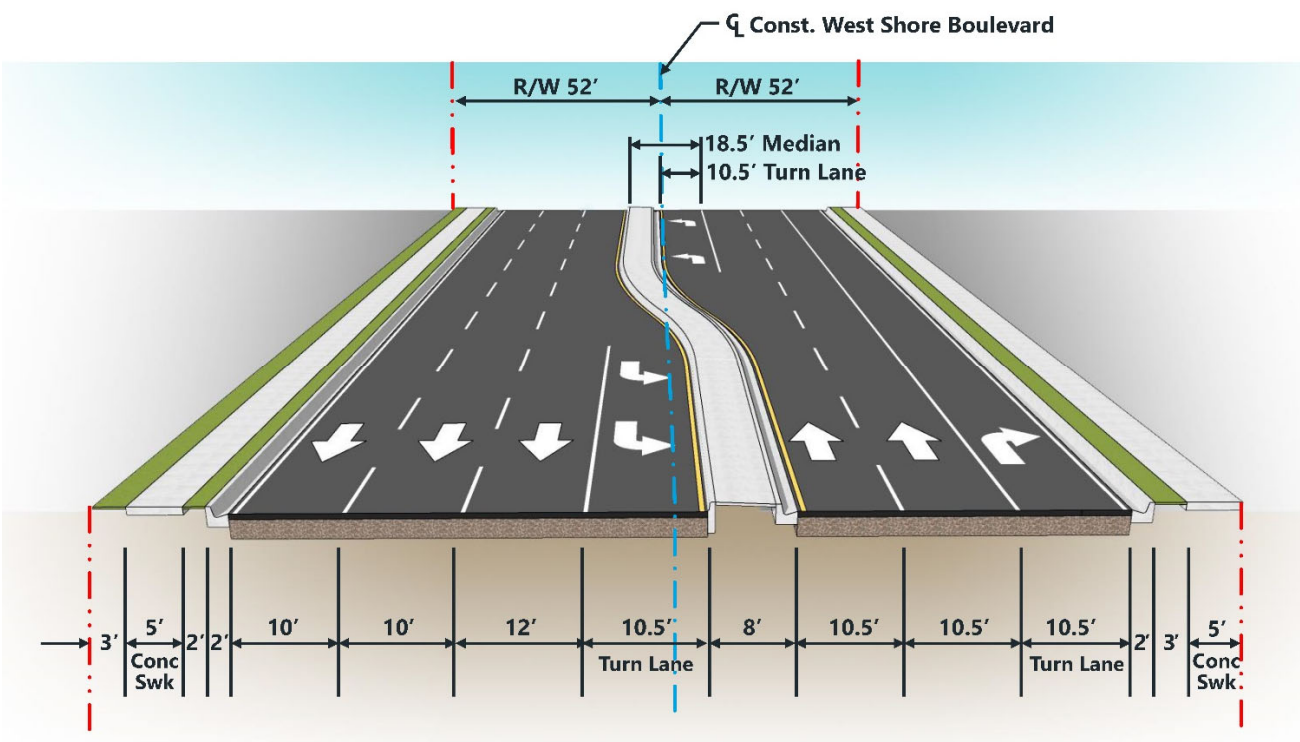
Existing Typical Section Beneath I-275 (SR 93) Bridges
